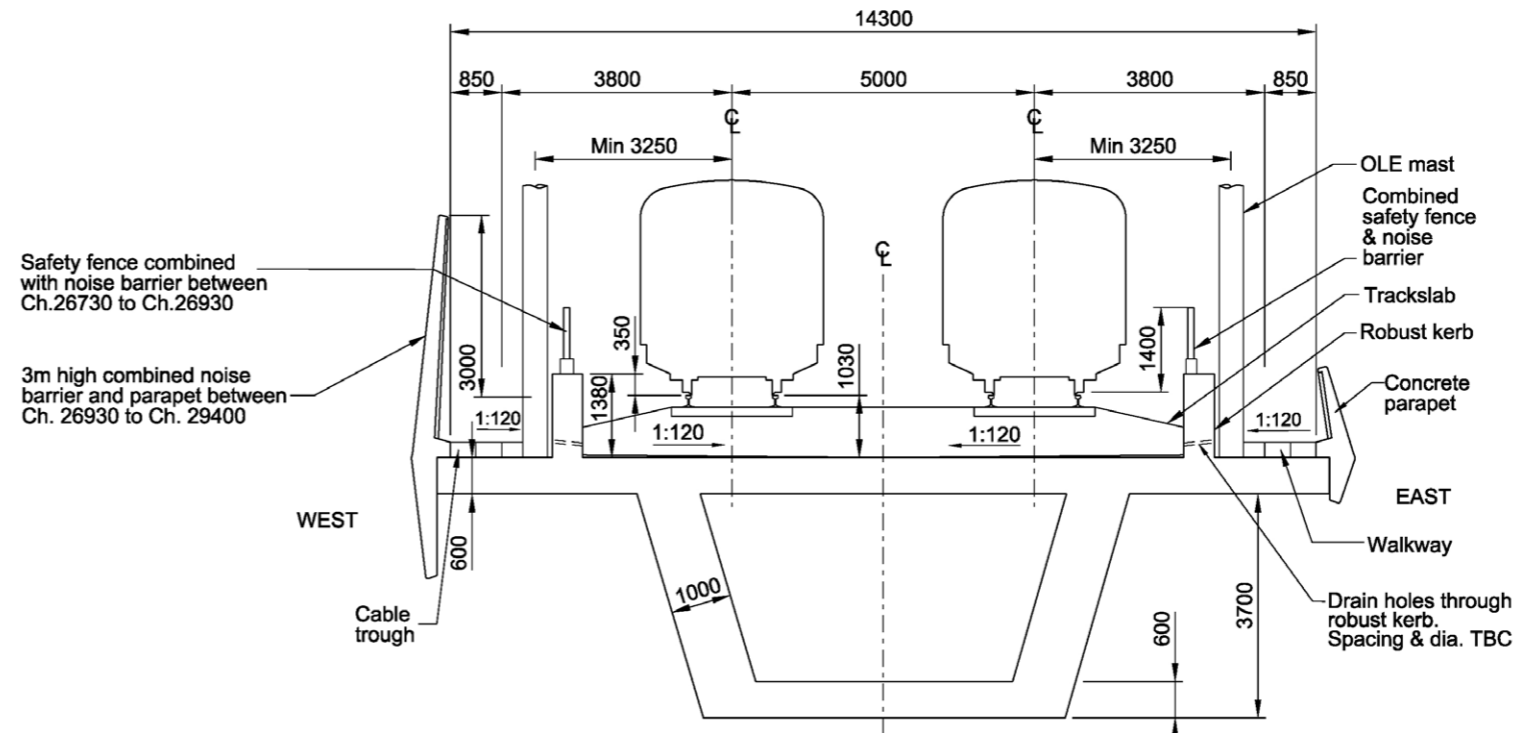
\_ HS2 Ltd design to support Hybrid Bill - Typical section (straight section)
